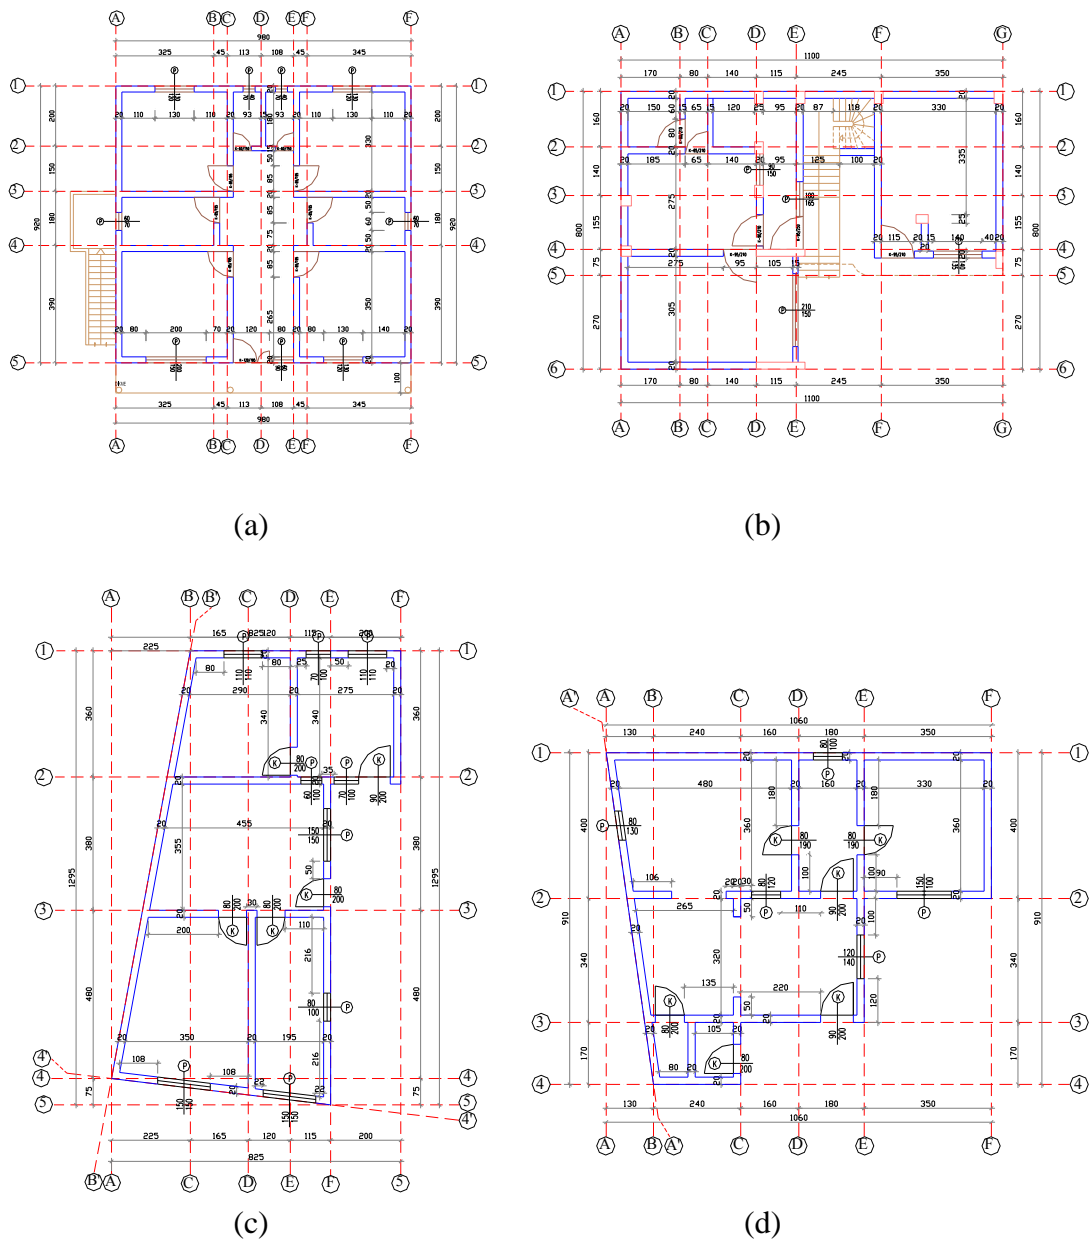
8. Typical plan layouts of existing masonry buildings in Fatih, Istanbul. a) regular, b) L-shaped, c) with non-parallel axes of structural elements, d) very irregular.
